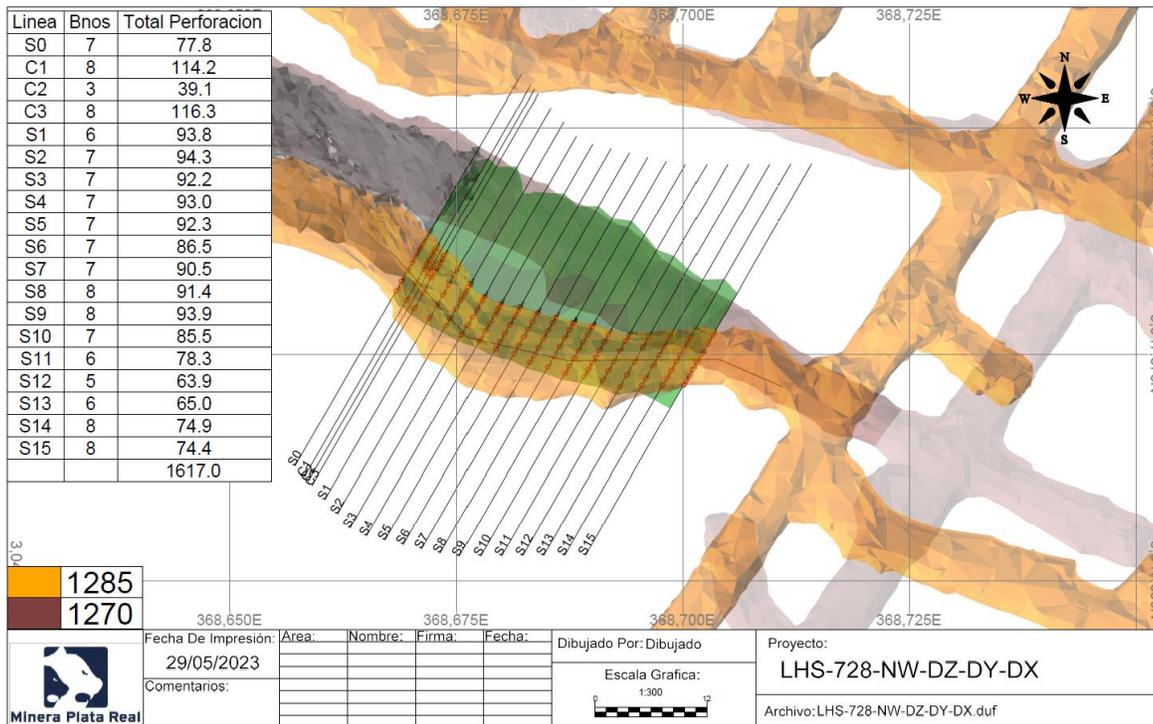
Drilling Layout for Longitudinal Longhole Stope – Plan View
